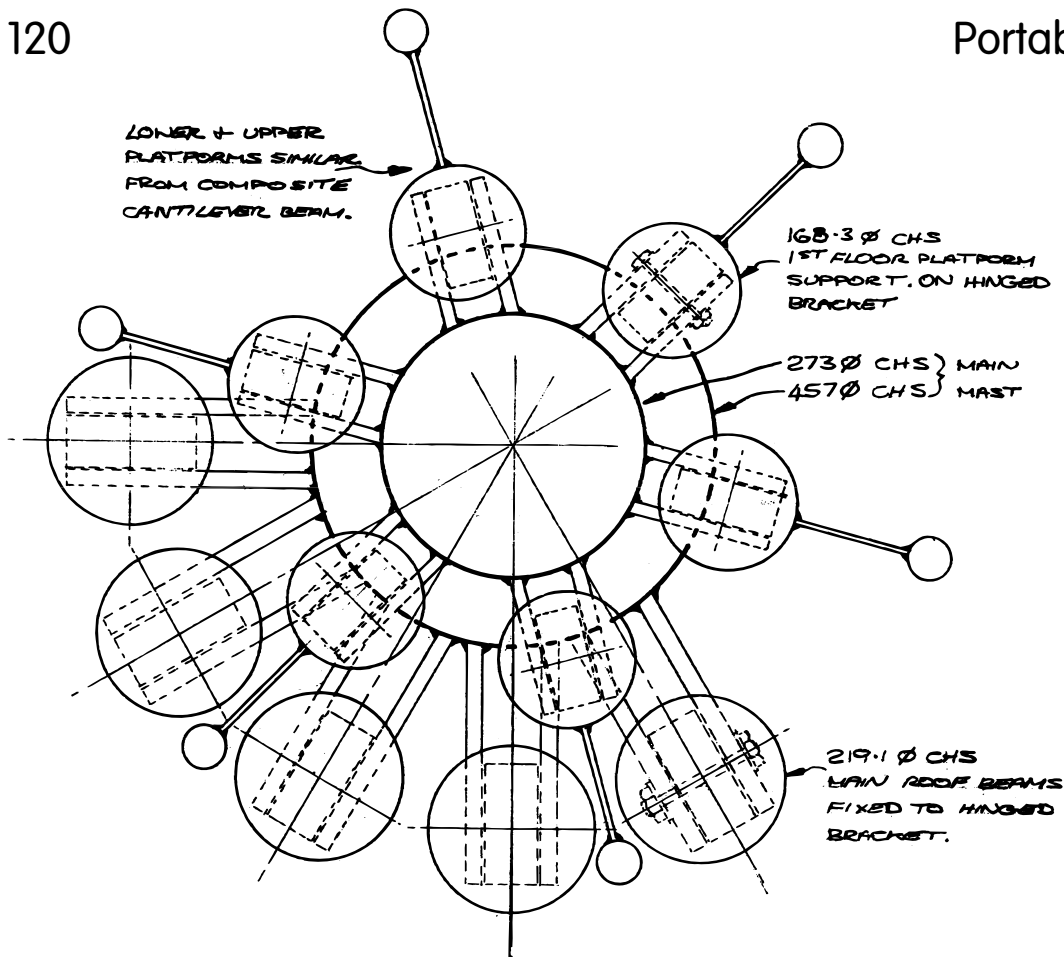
Horizontal section through mast showing the supports for floor and roof beams and observation platforms.
